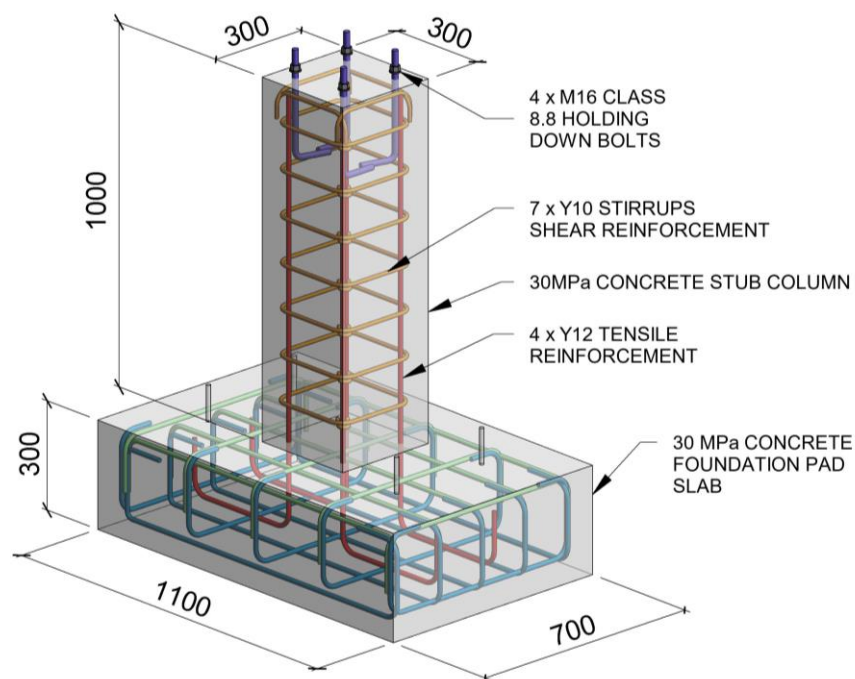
Three-dimensional visualisation of the reinforced concrete footing (Units in mm)
